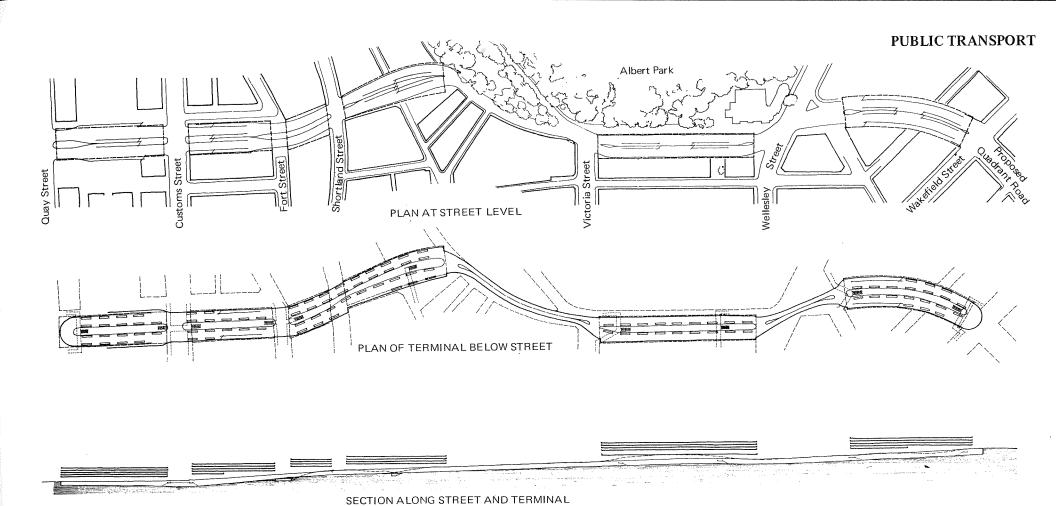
Plan and Section of proposed Kitchener Street underground terminal
